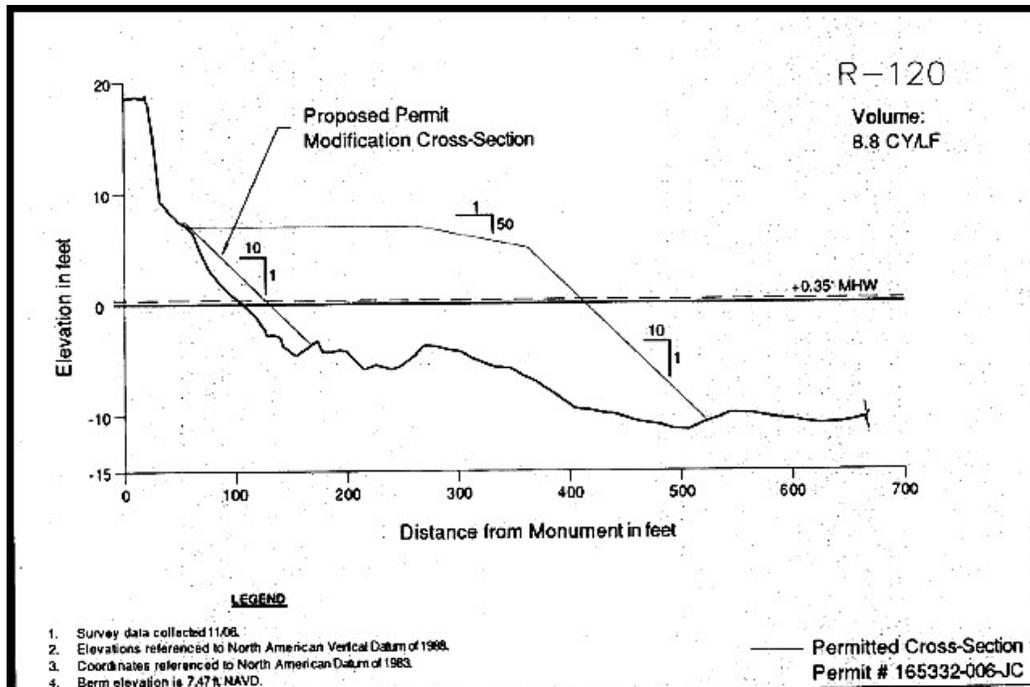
Sample Section 404 and Section 10 permit application—beach renourishment project. Cross-section and berm elevations are referenced to NAVD88. MHW relationship above NAVD88 is indicated. (The HTL is not indicated).
